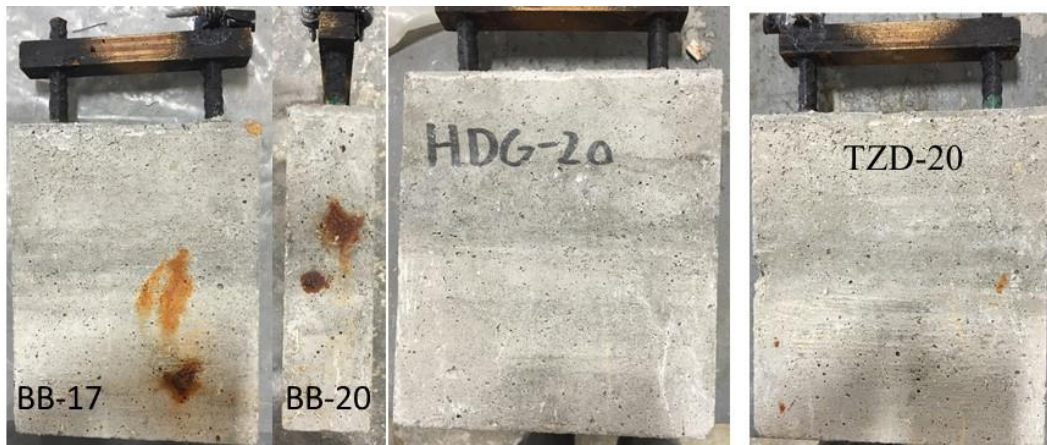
U-bend specimens after 1.4 years of corrosion testing.
